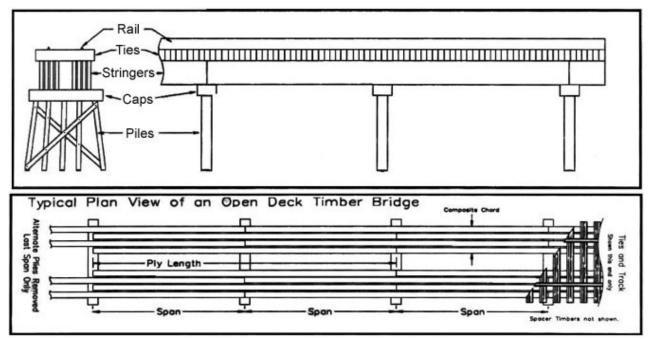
Schematic of a standard open-deck timber trestle railroad bridge
